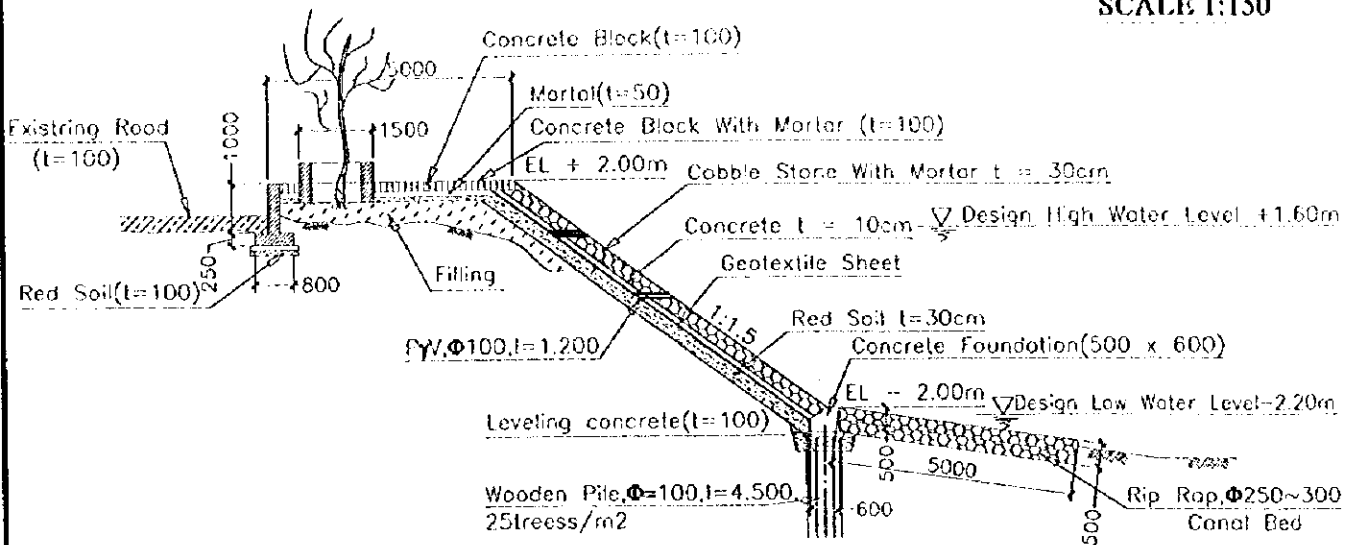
(4/5) PROPOSED CROSS SECTION OF TAU HU - BEN NGHIE CANAL
